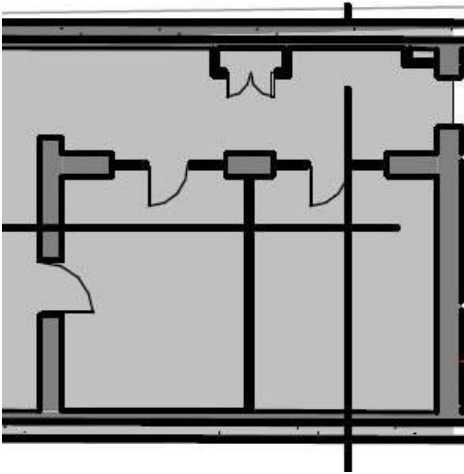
Original construction drawings showing the original layout of the clerk/inquiries space. (Source: State Records).
